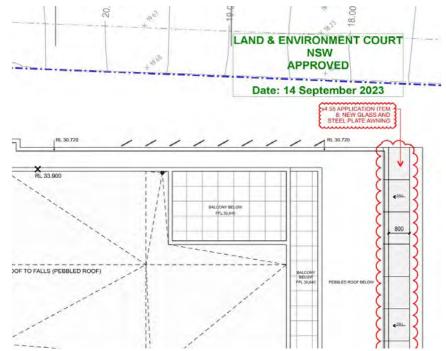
Extract of Approved Plan DA_100_50 Rev. 13 per DA 333/19/4
